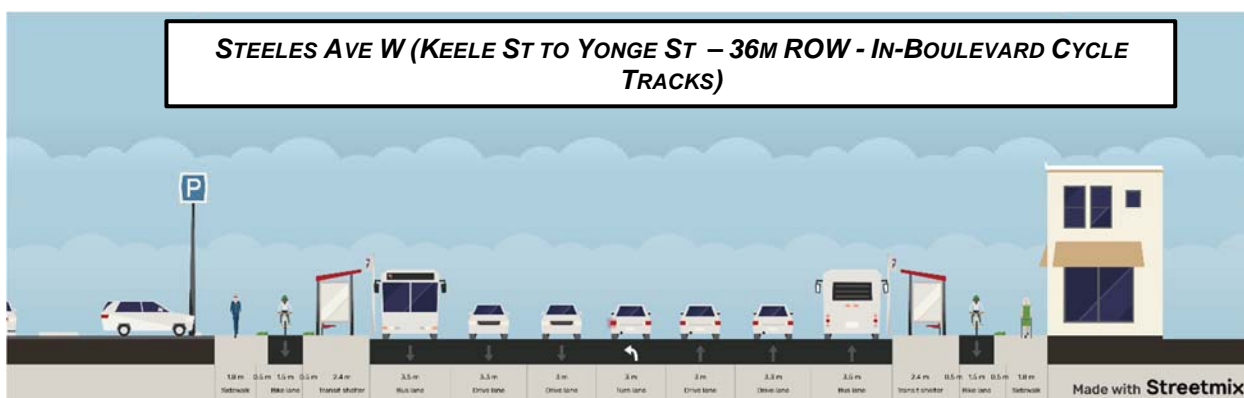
STEELES AVENUE WEST – CONCEPTUAL CROSS-SECTION FOR 36-METRE ROW
